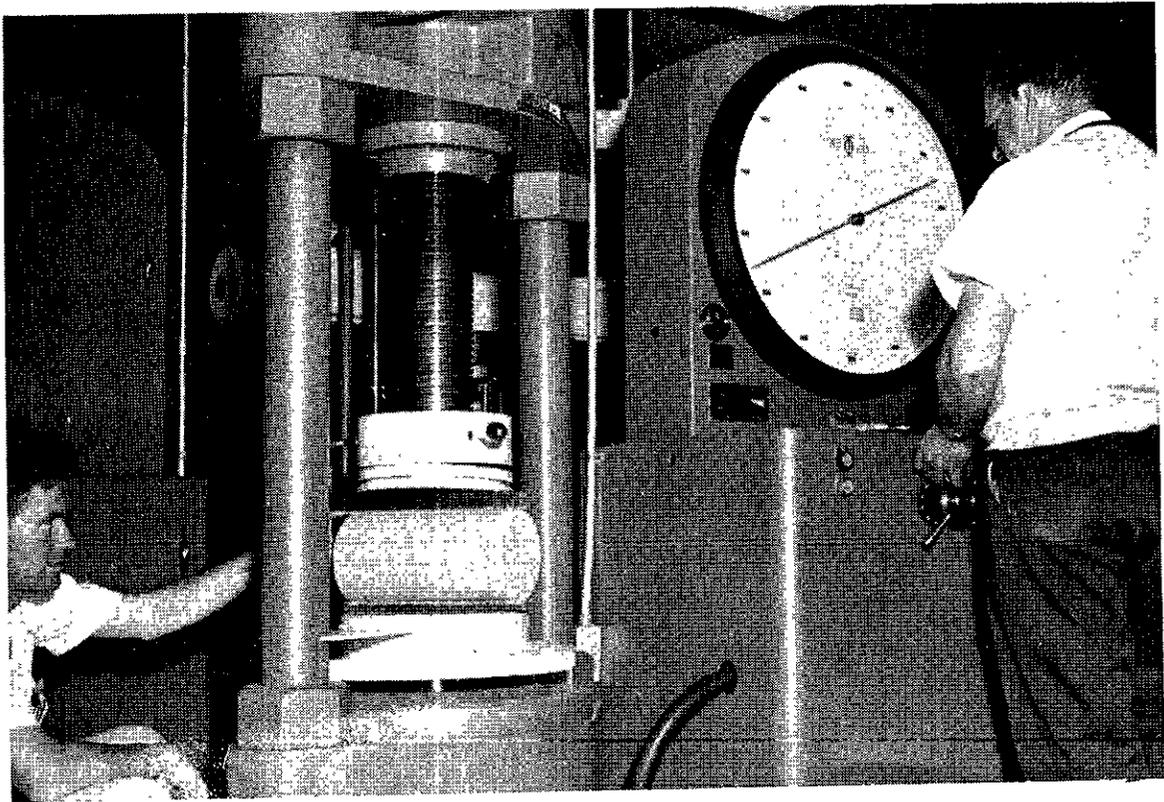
Tensile splitting test on 6x12-inch cylinder.
